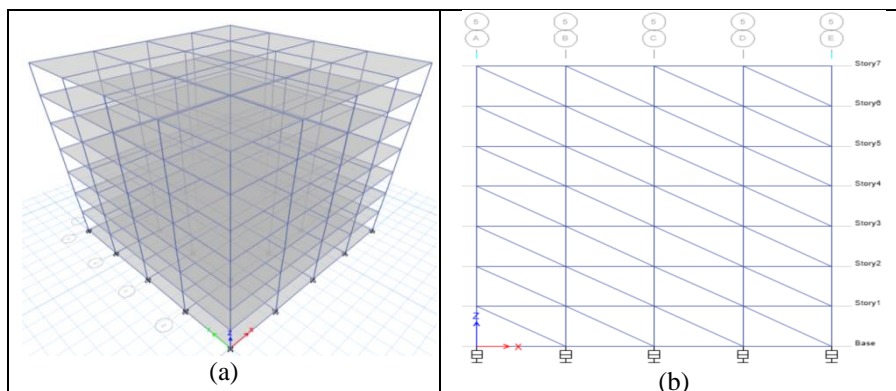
(a) Bare frame RC building (b) With Infills walls RC building for G+7
